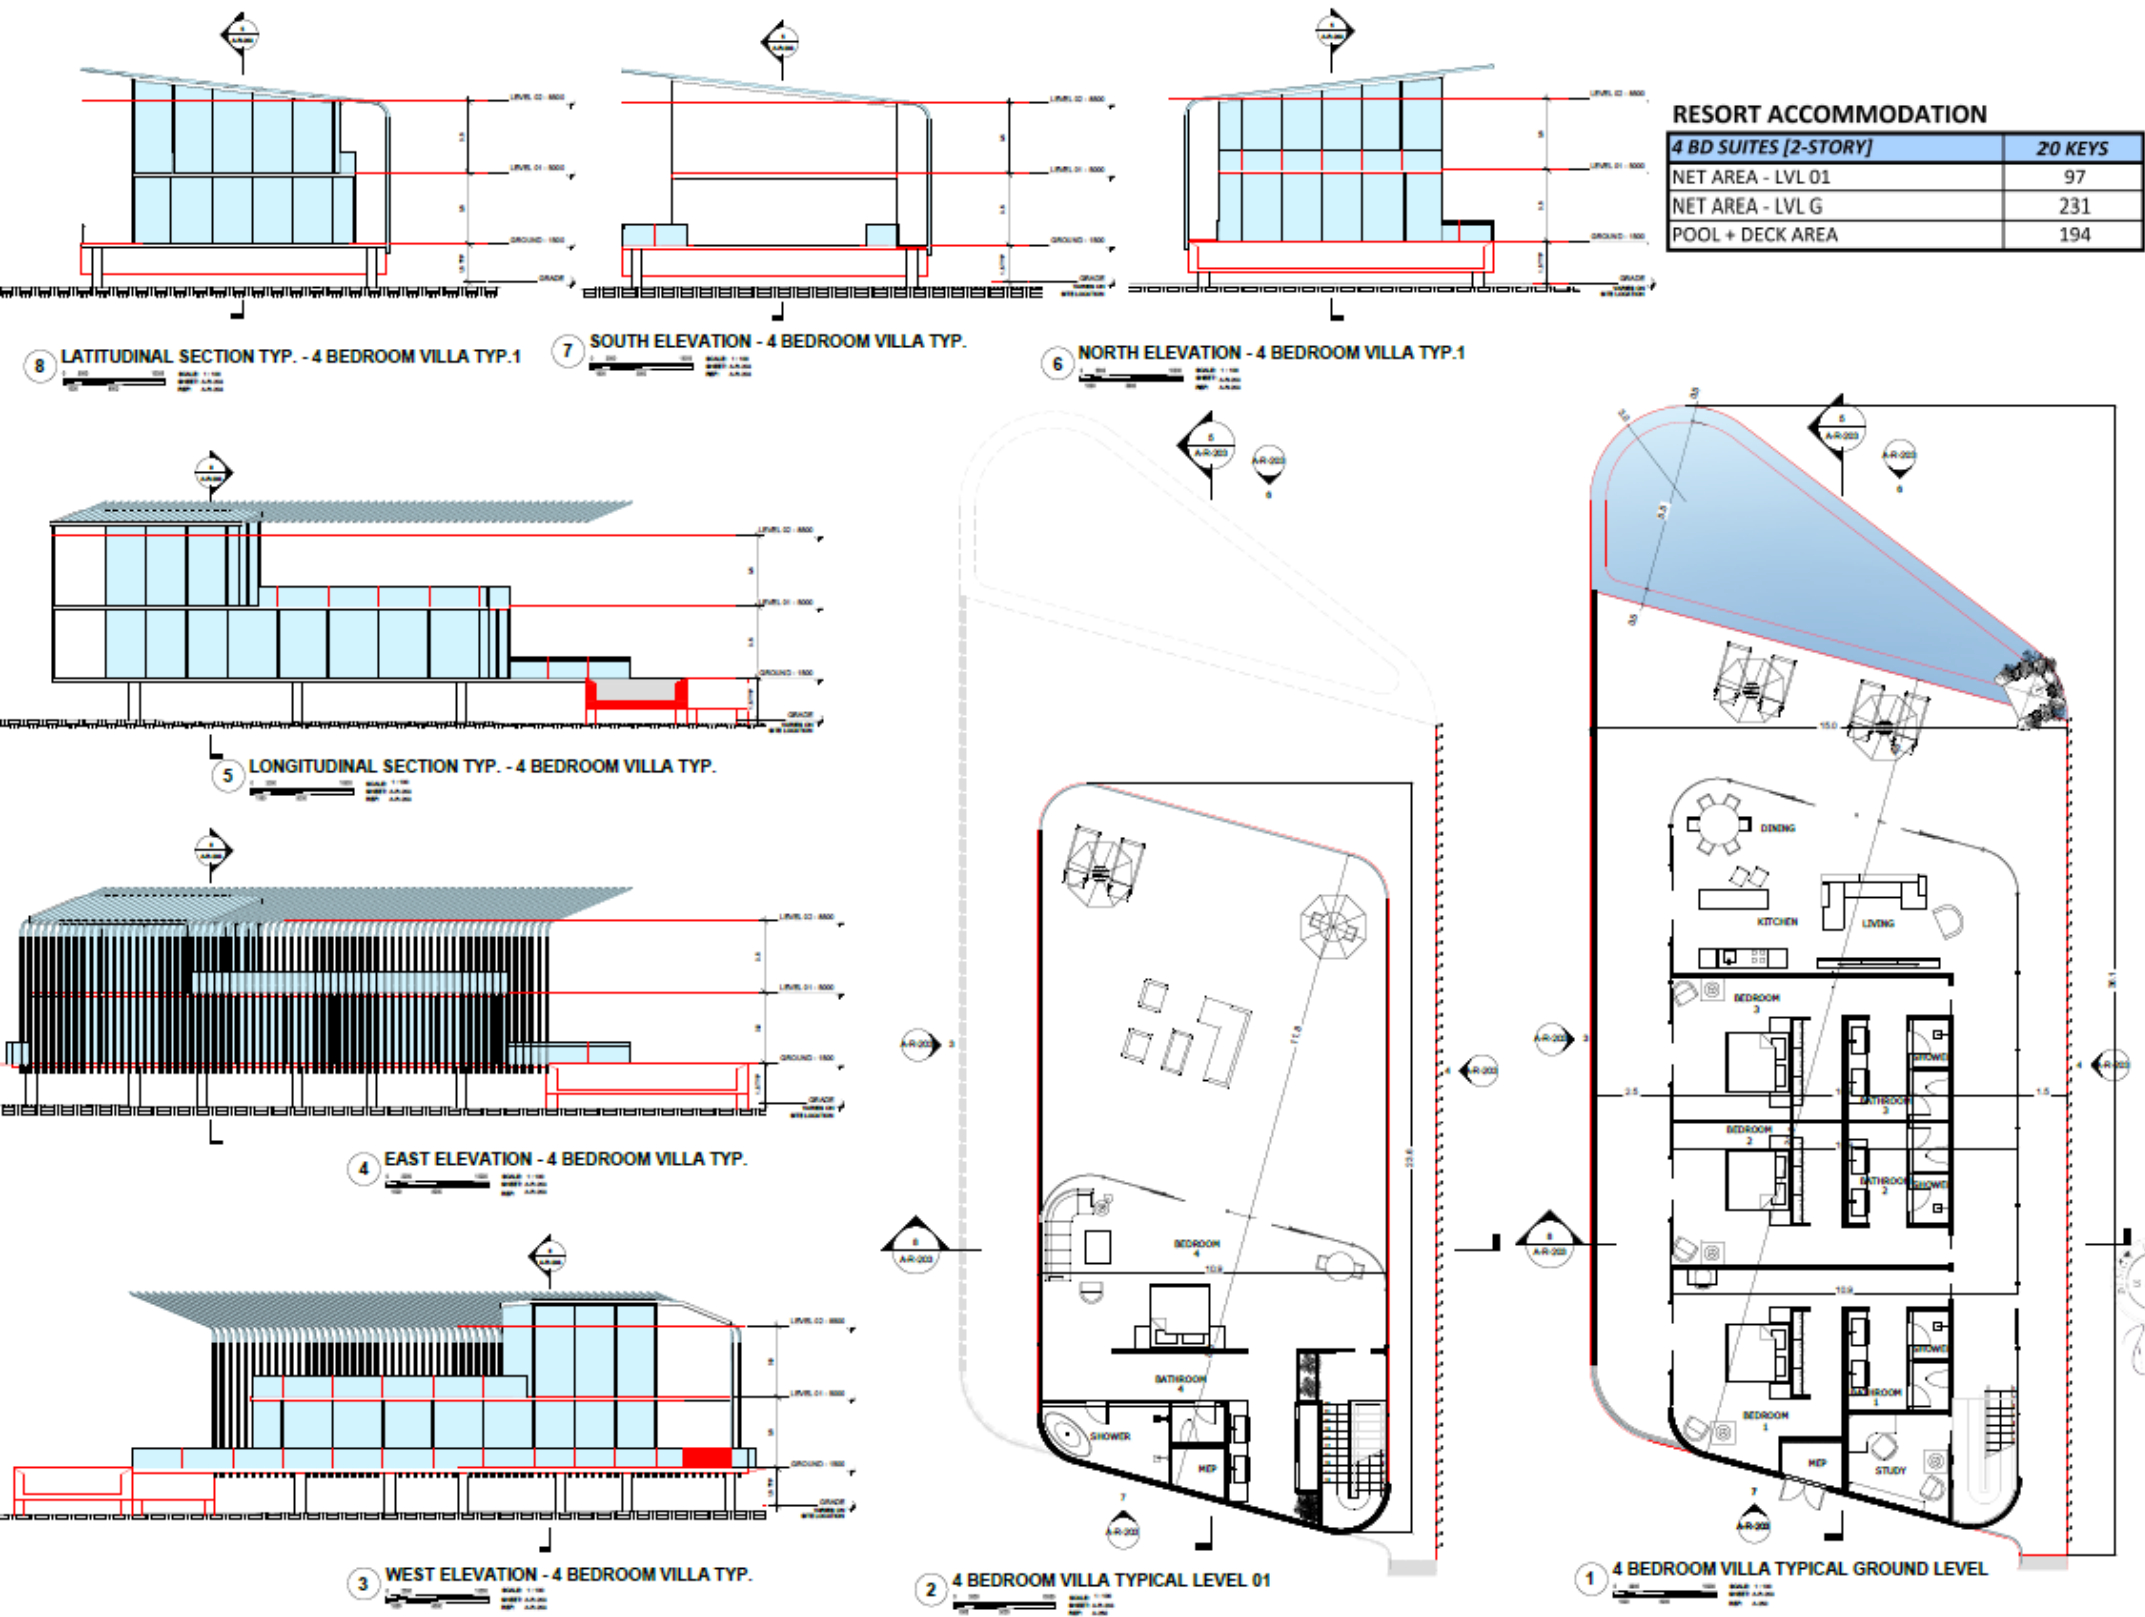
Resort 4-bedroom suite plans, elevation, and sections
